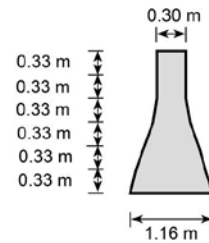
Optimized cross section of the gravity retaining wall of 2 m height.
